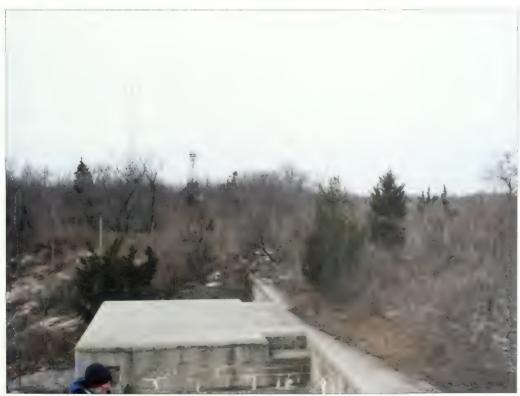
View looking west at gun platforms #5 and #6, Battery Urmston. The engineered slope meeting the concrete structure on the west and north sides contains woody vegetation growing on, or within, four feet of concrete structures and should be removed (Olmsted Center, January 2009).
